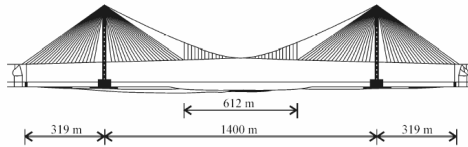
Elevation of the example cable-stayed-suspension hybrid bridge
